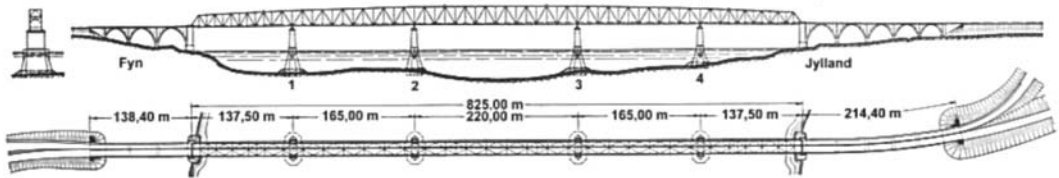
Little Belt Bridge of 1935. Plan and elevation.
